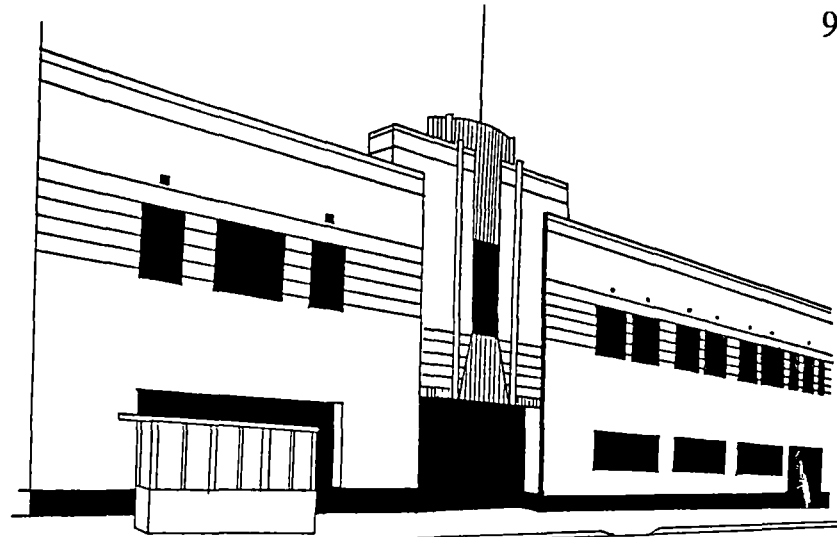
The former facade of the Mercury Building fronting Argyle Street
